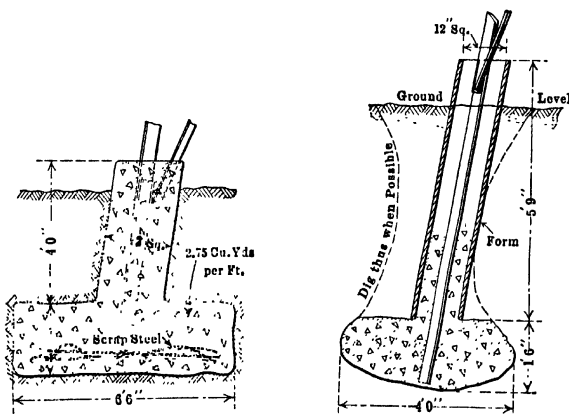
Stub footing for angle tower. FIG. 136.—Tower footing.
